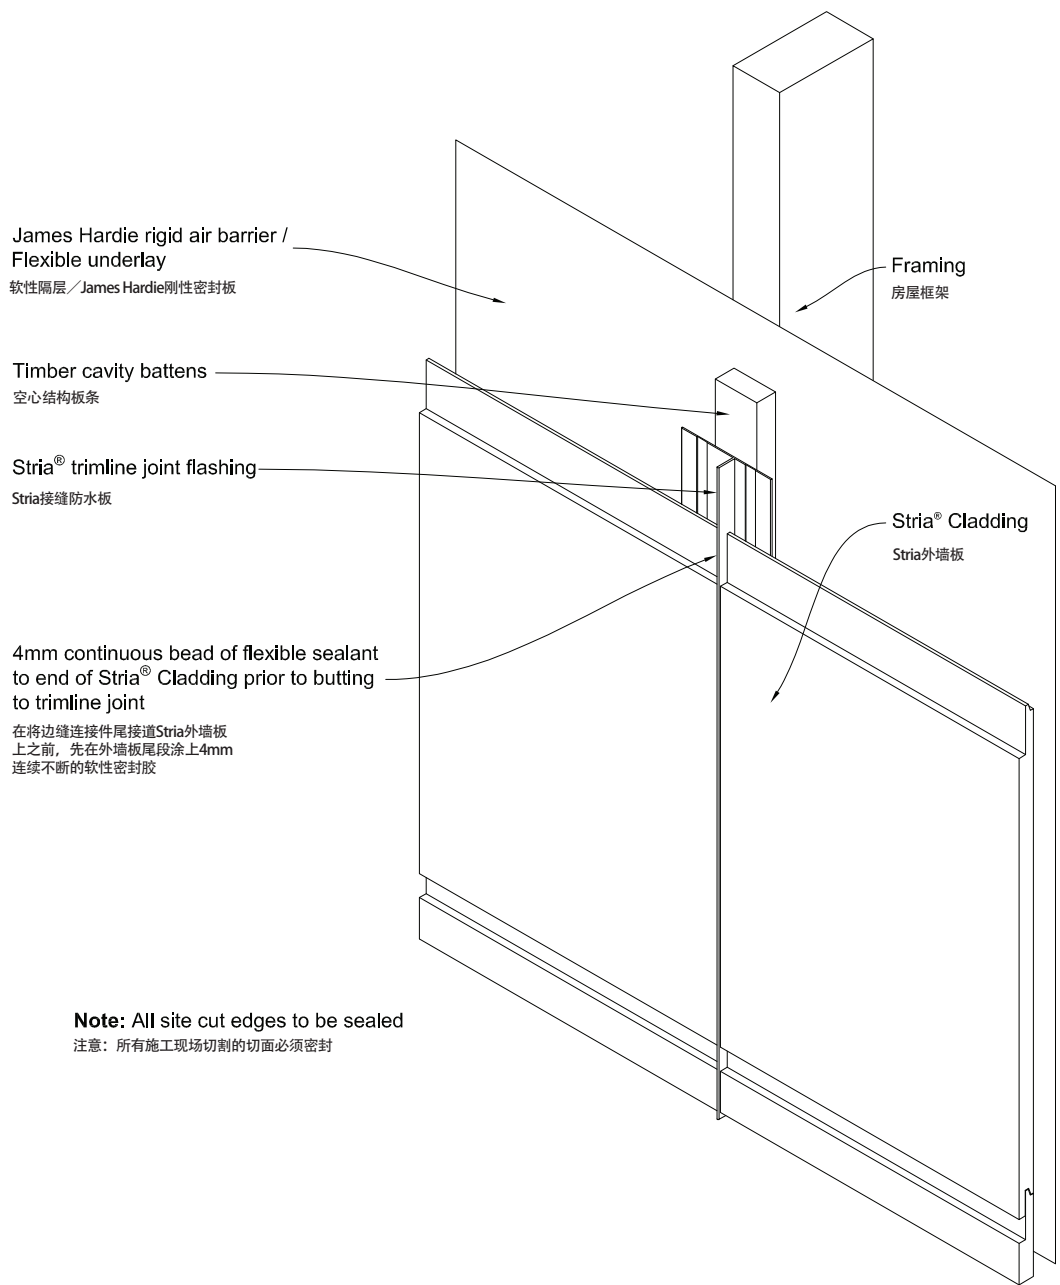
Vertical joint flashing option 图9: 纵向连接防水板可选方案v
